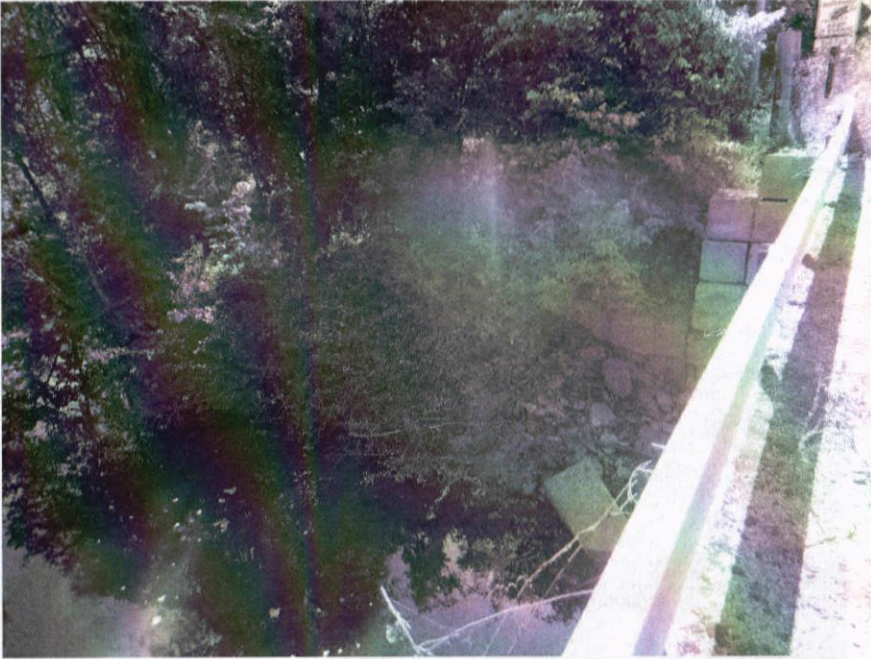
Facing southeast from the bridge over Bull Fork Salt Creek.
